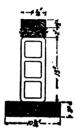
McRoy Tile, 2-Duct Conduit, Class "B" Construction.
